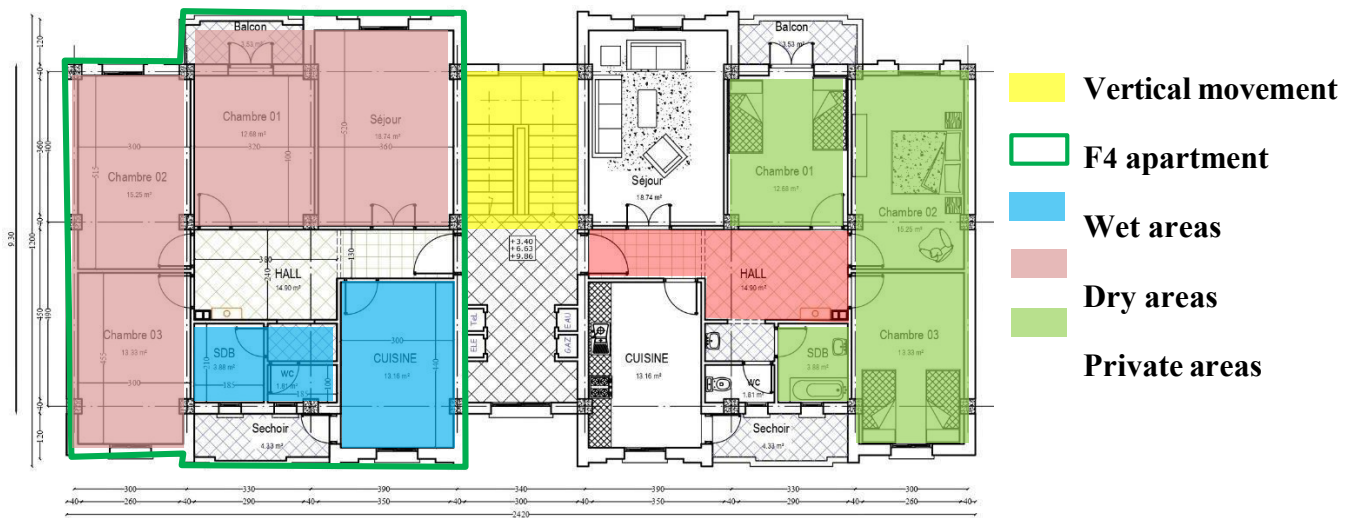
Floor of bar block (Source: design office Nebar Omar +Author treatment , 2025).
